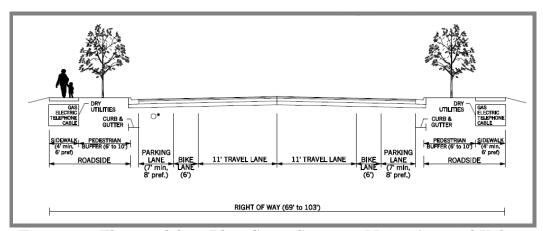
Thoroughfare Plan Cross Section: Major Arterial Urban
